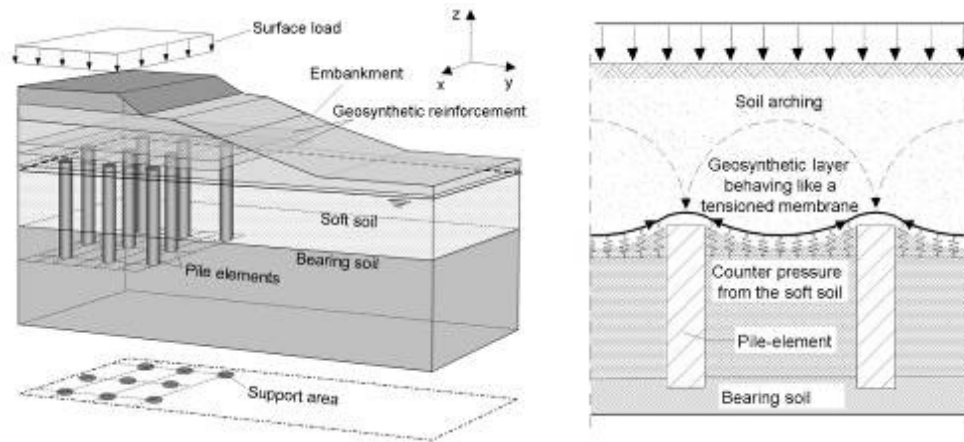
Geosynthetic-reinforced and pile-supported embankment.
